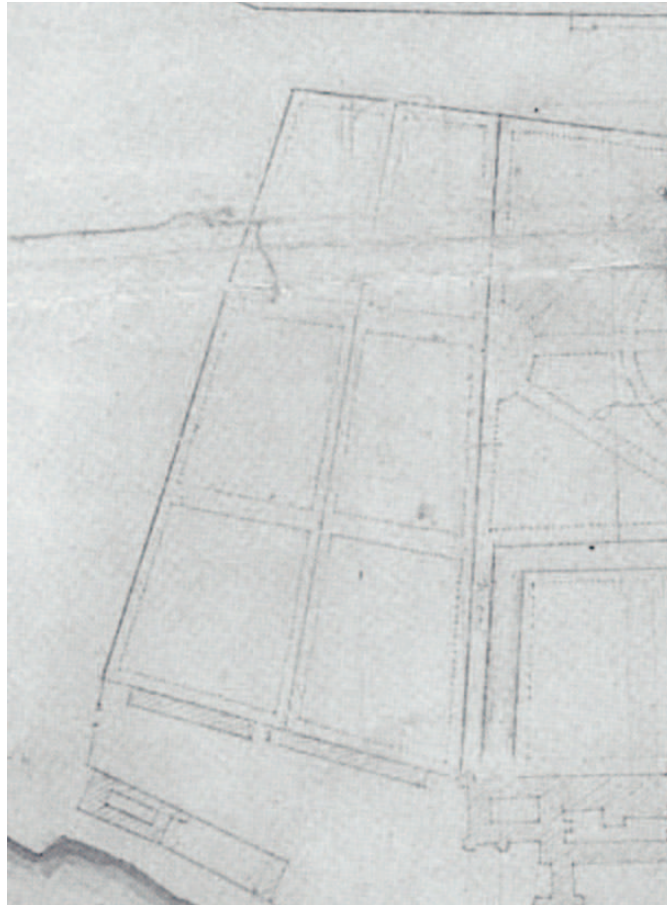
Plan and Survey of the Tudor Palace by Nicholas Hawksmoor (c. 1689)
